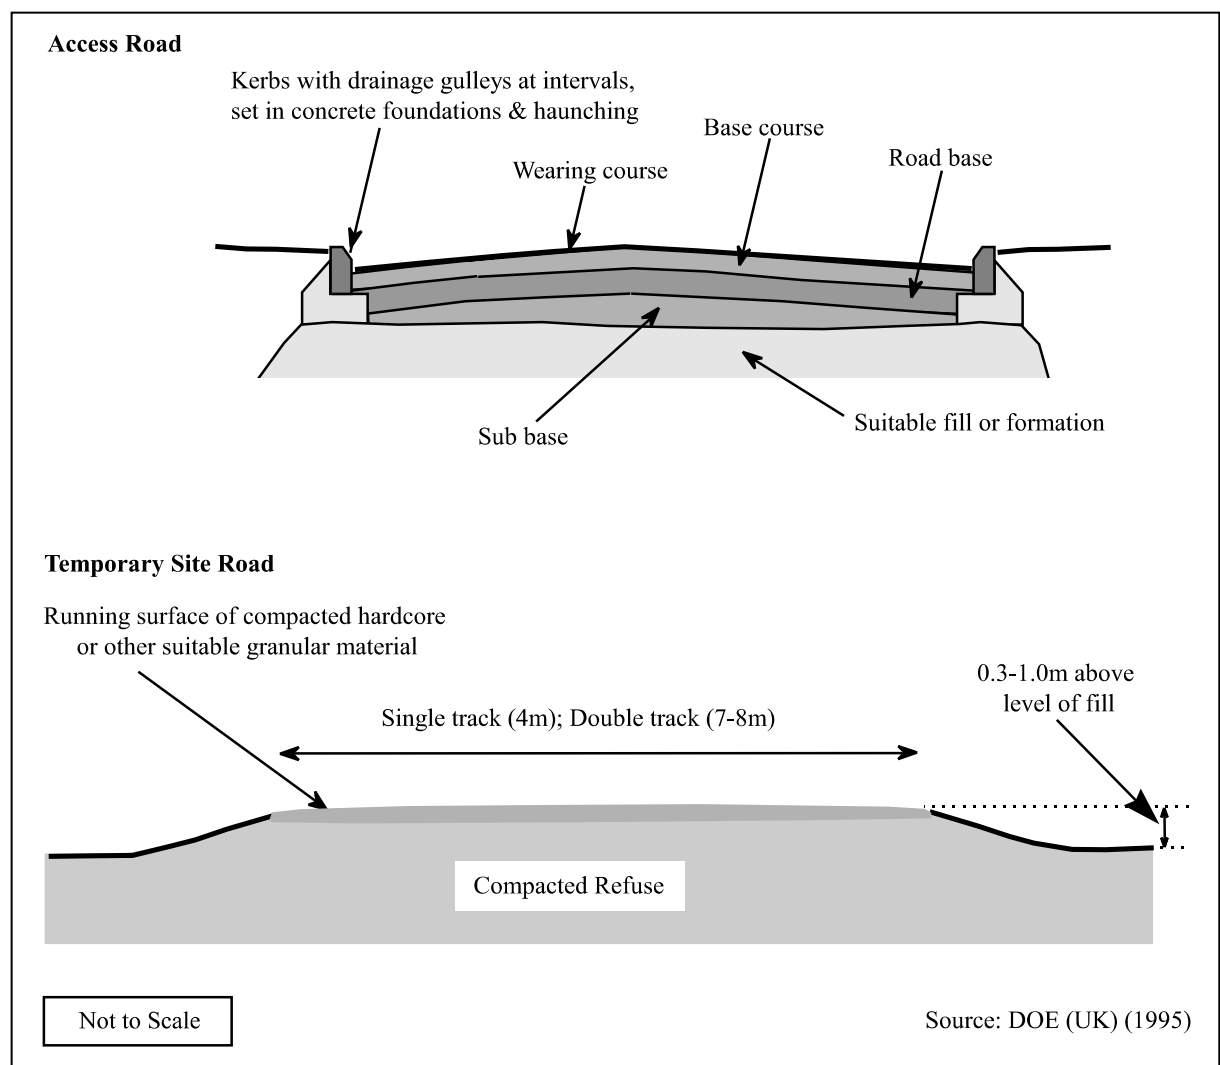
shows a typical cross section of both an access road and a temporary site road.
